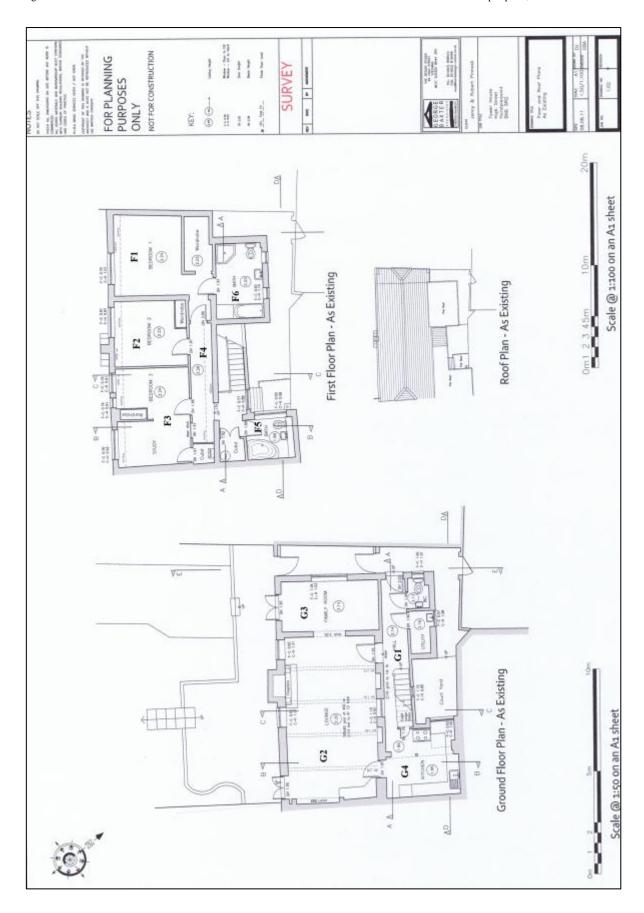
Tower House, Hurstpierpoint: Existing plan of Tower House (Adapted from architects drawing)
